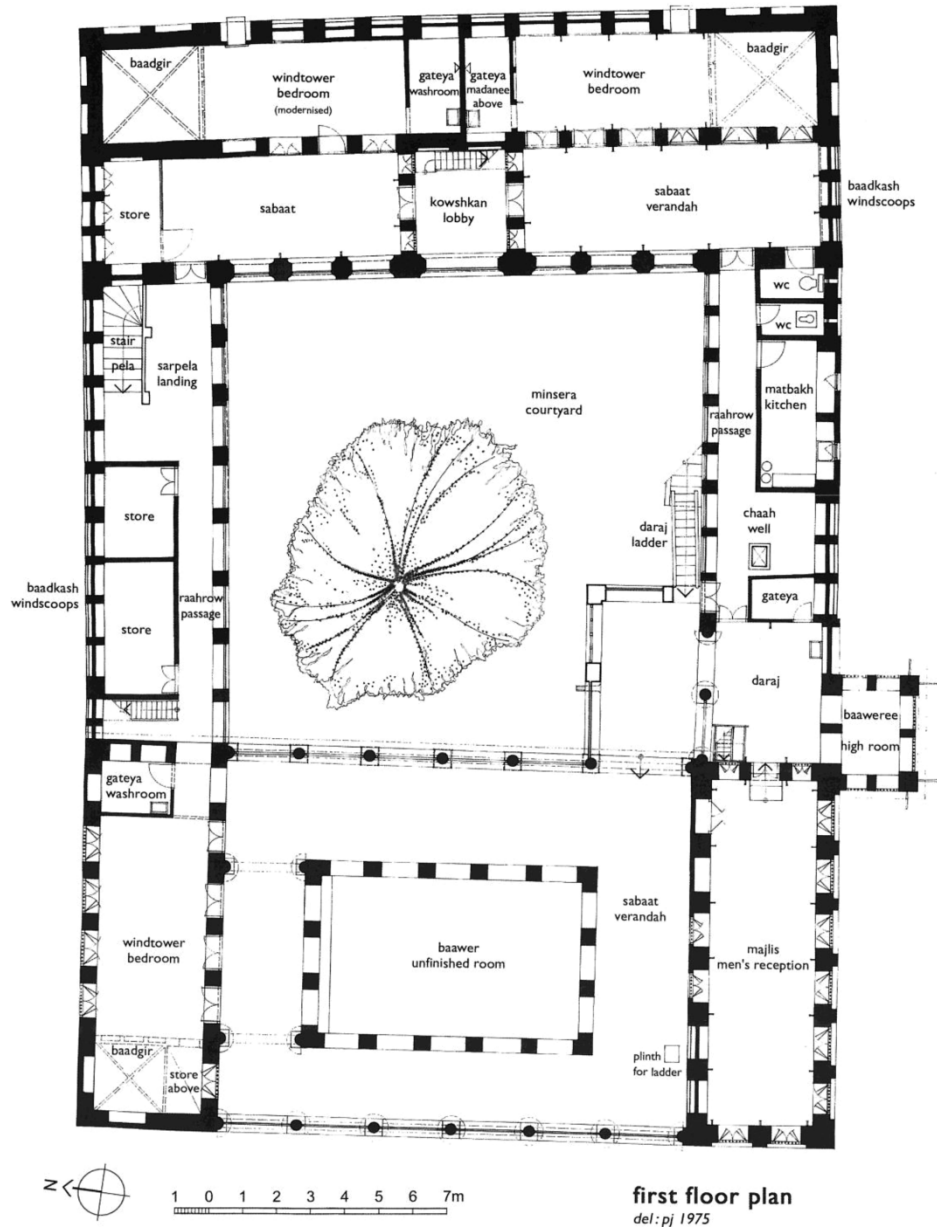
Plan of the Bukhash house, the grey rooms are studied here.
